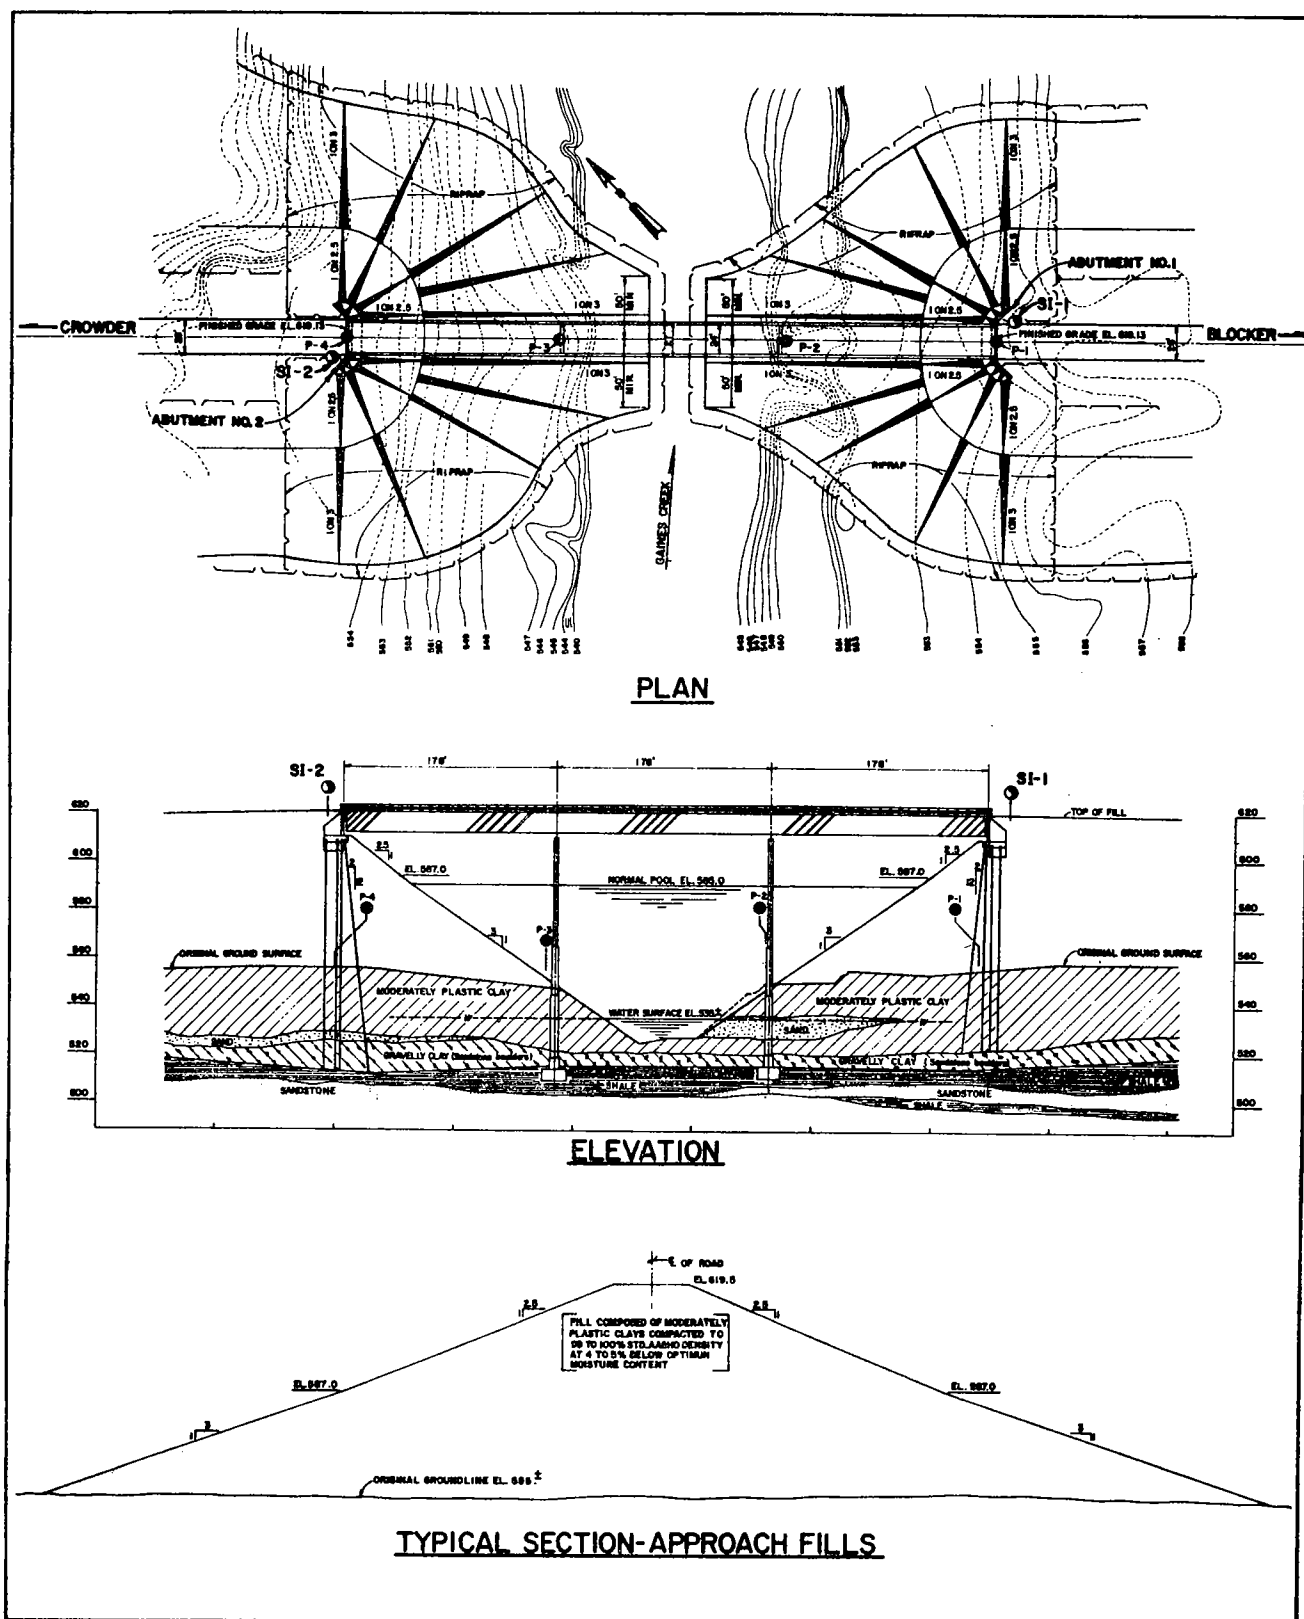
Plan and section, Gaines Creek bridge, P-18 relocation.
